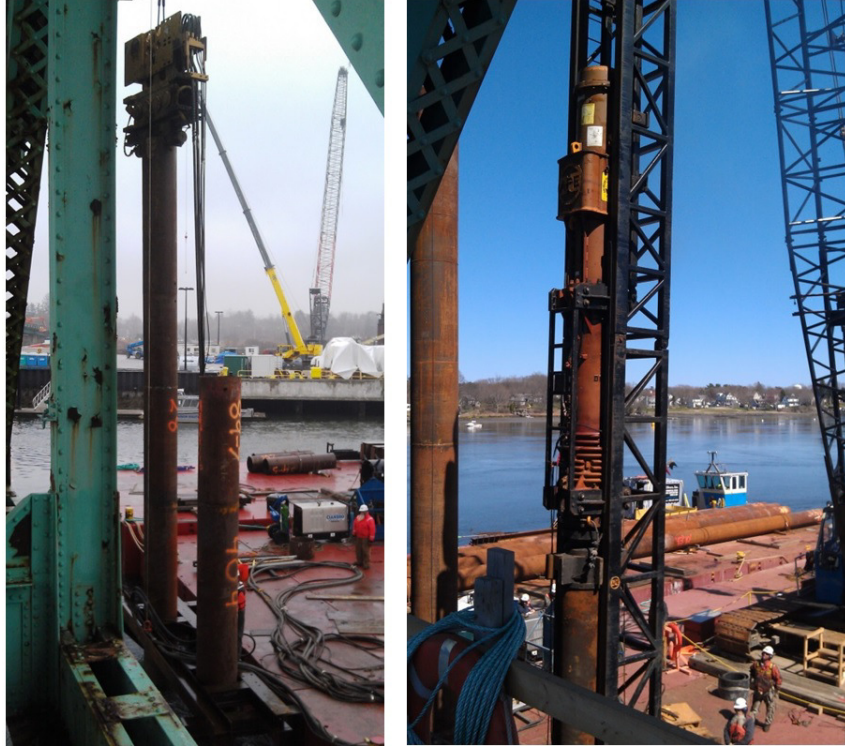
Driving 30" Pipe Piles with an APE Model 200 (left) and Model D62-42 (right) Hammers
